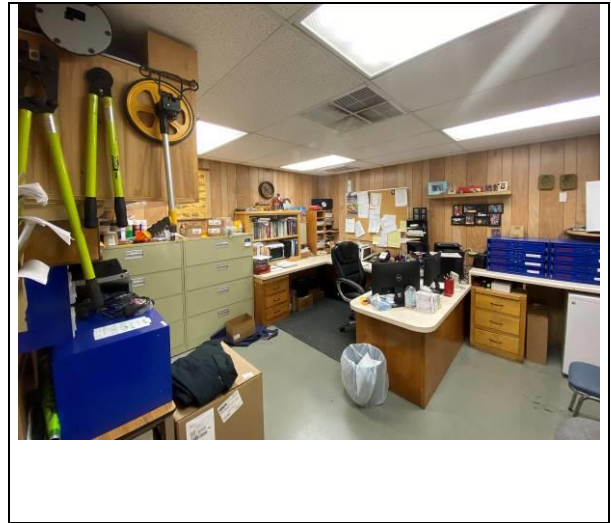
View of assumed white (2'X4') ceiling tile with pinholes/worm trails in the shop office.
